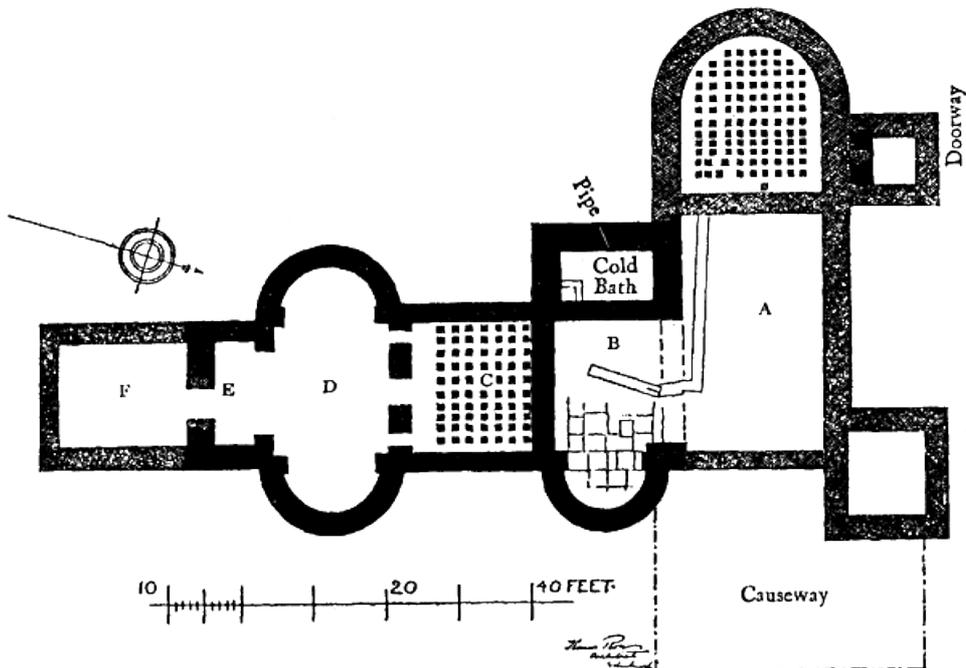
PLAN OF BATH AT INCHTUTHIL
